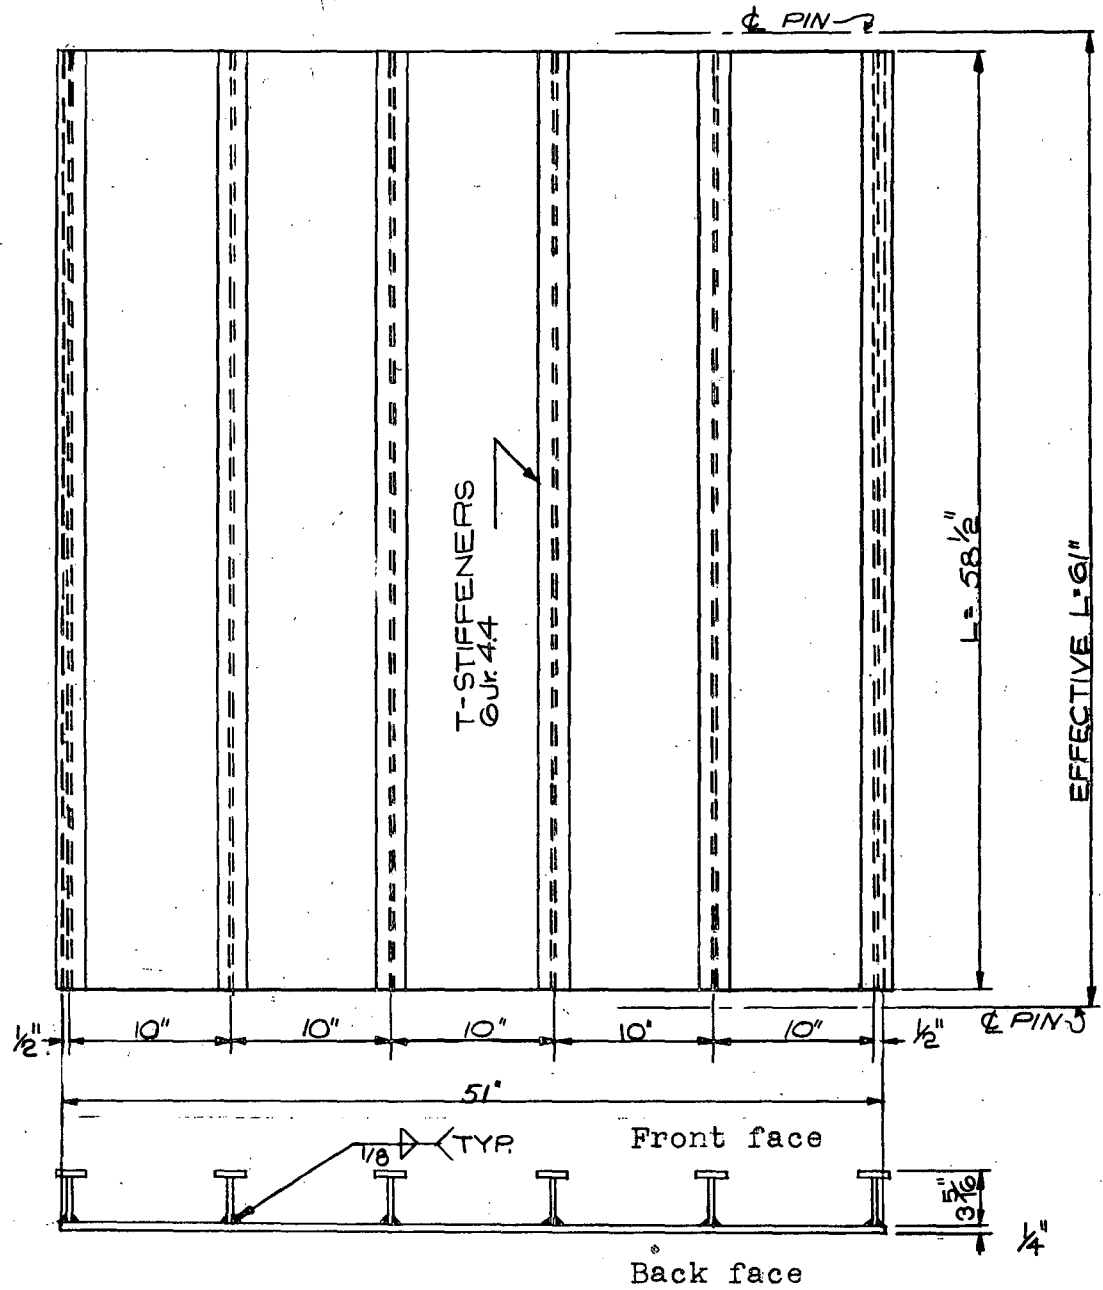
TEST SPECIMEN DIMENSIONS (T-6)
